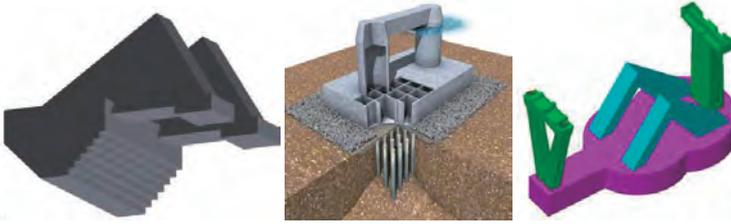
Foundation concepts; (a) North anchor block; (b) Tower foundations; (c) South anchor block
